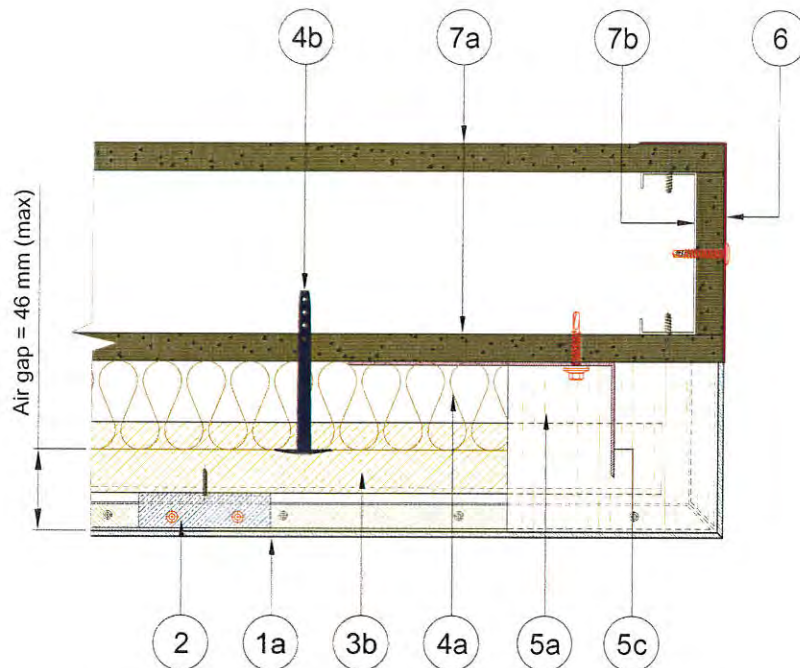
"Alstrong FR-B1" 4 mm thick Aluminium Composite Material Exterior Wall Cladding Assembly horizontal window section details
